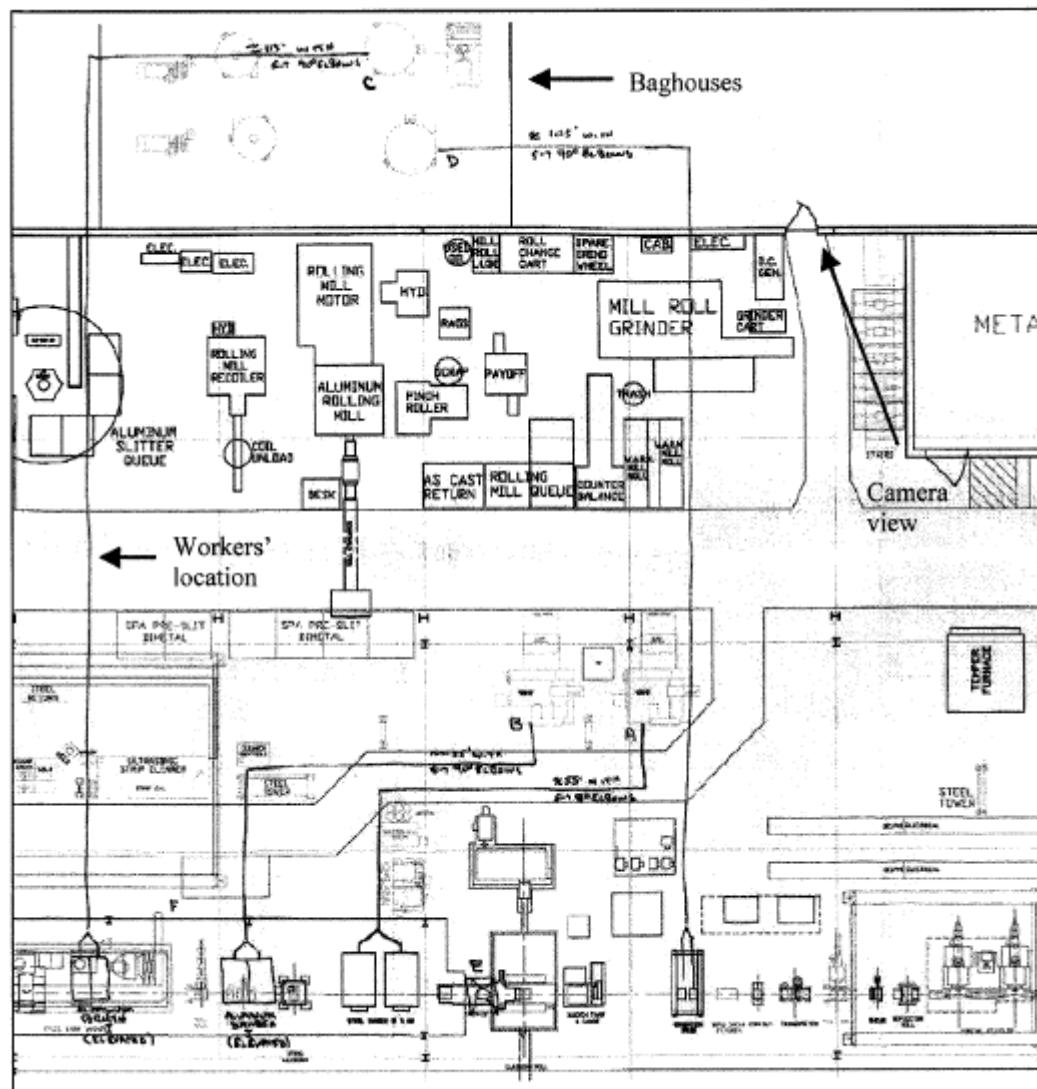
Floor plan of the plant area and baghouses. Annotations in red added by CSE.
